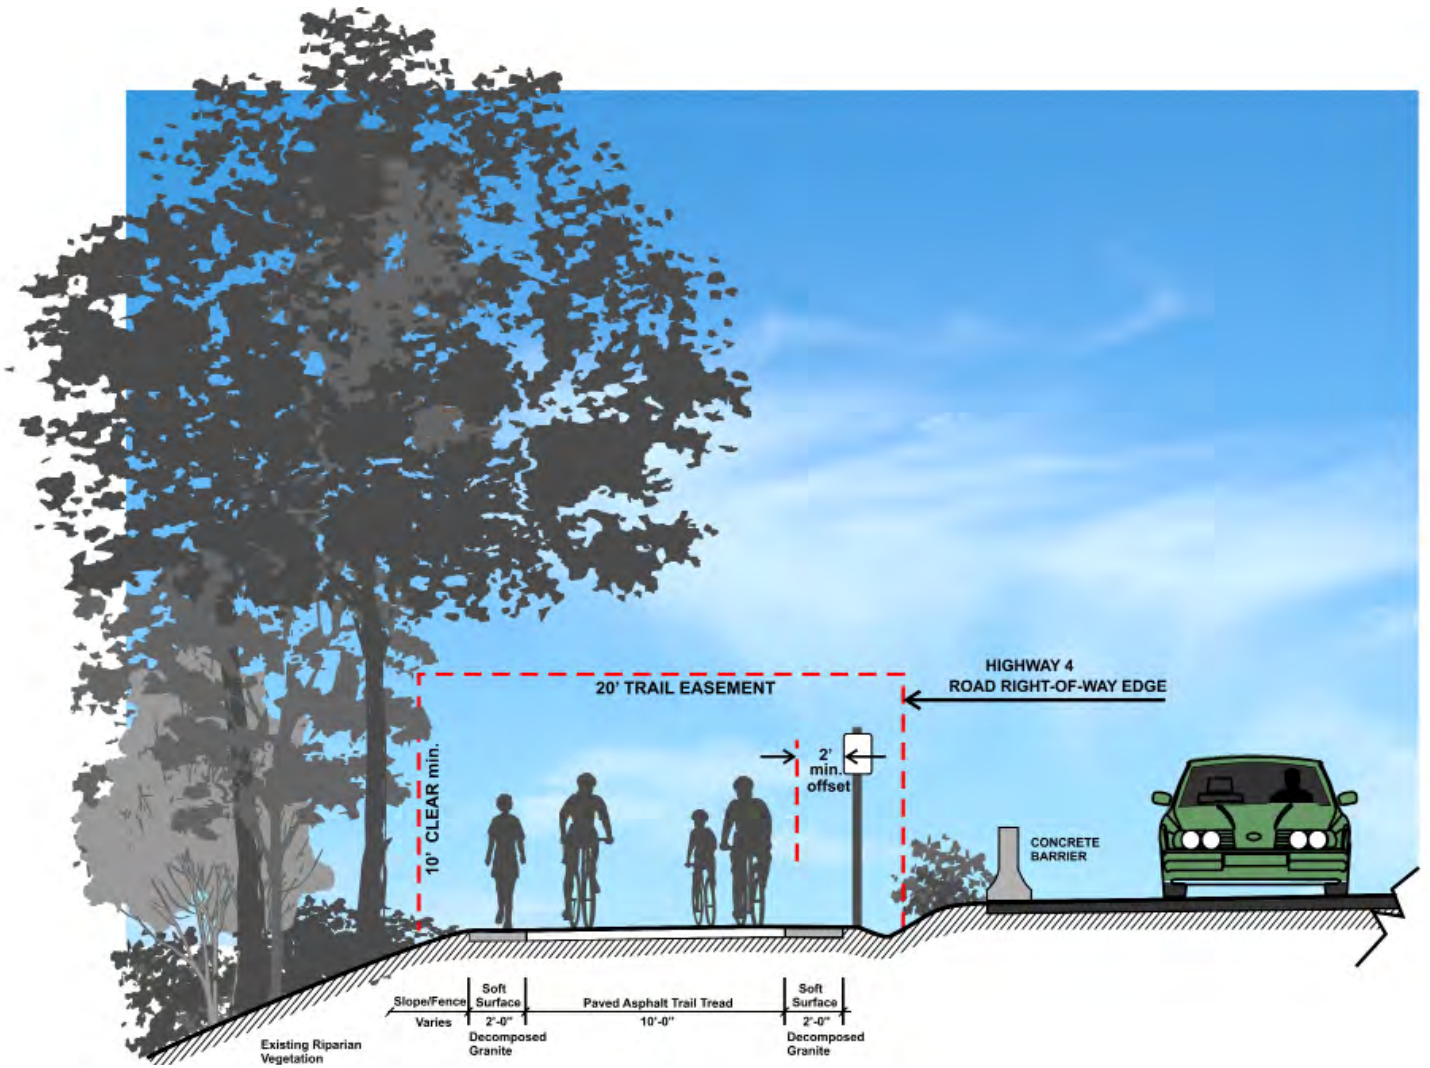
C: Type A Trail (Asphalt Paved Class 1 Path Next to Hwy 4)
